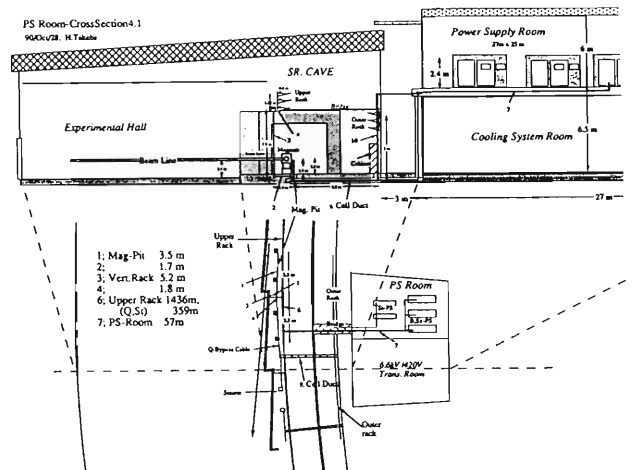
Cross-sectional view of the SR machine room (Cave) and power supplies room.
